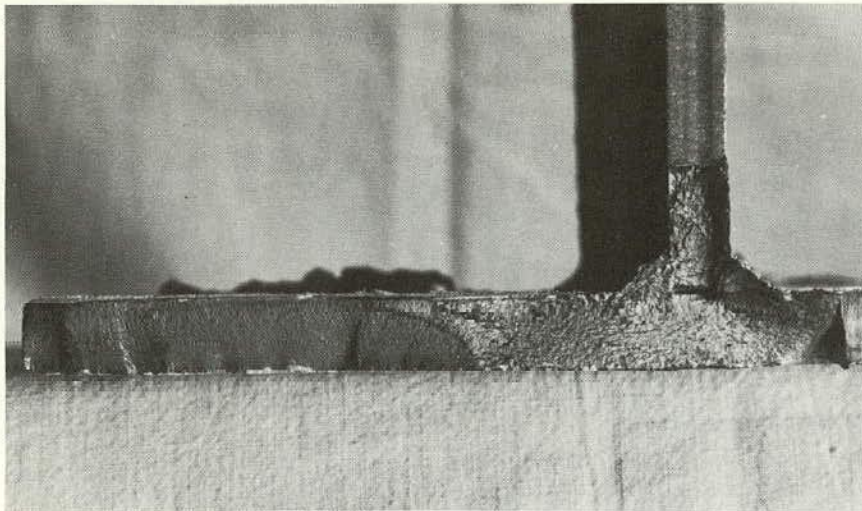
Typical fatigue crack surface at flange attachment with transverse weld.
